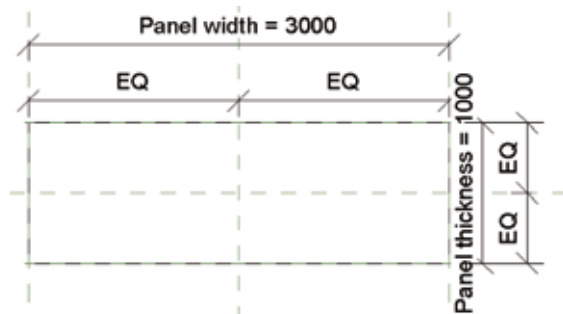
Cross-Section View of Diaphragm Wall
